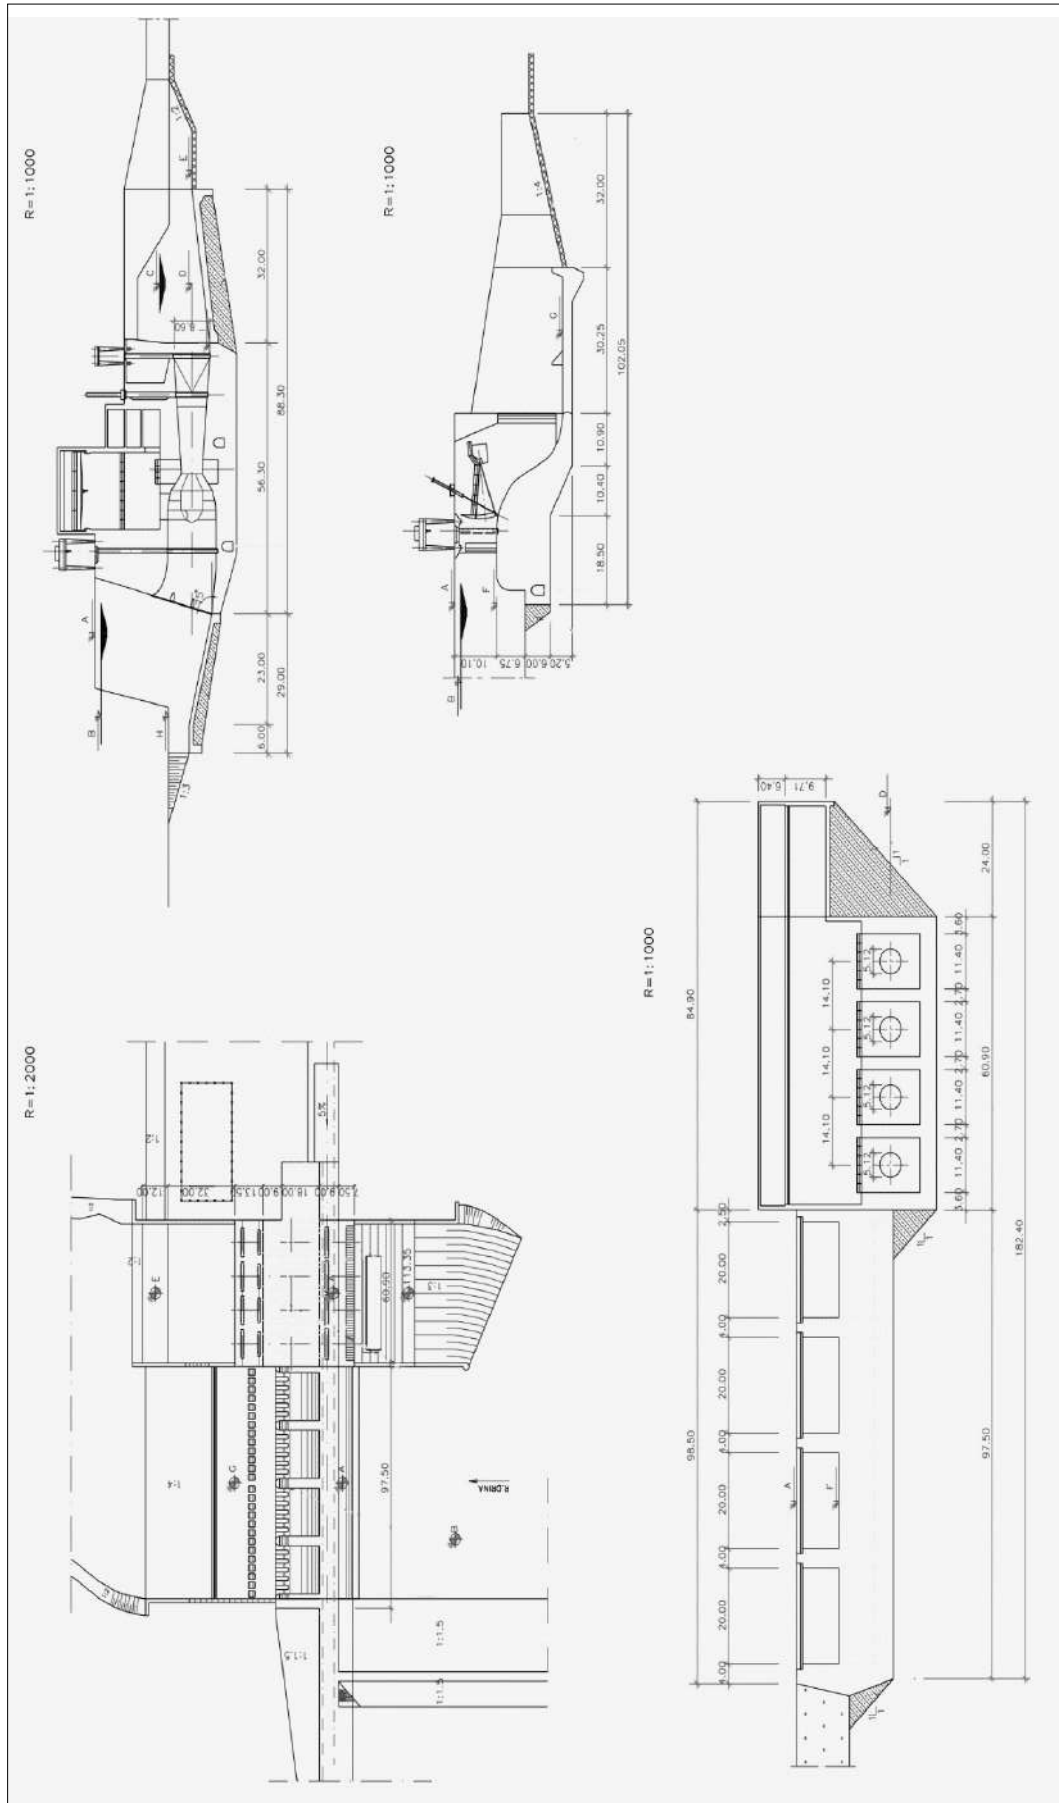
The layout of the uniform dams and HPP Drina I, Drina II and Drina III with cross-sections through the powerhouse, spillway and the concrete dam
